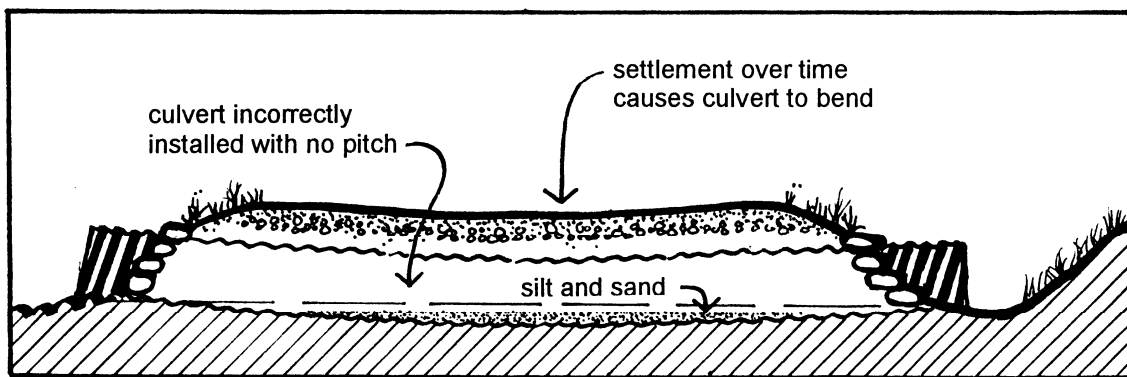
Incorrect way to set a culvert: center too low; silt freezes and plugs culvert.
